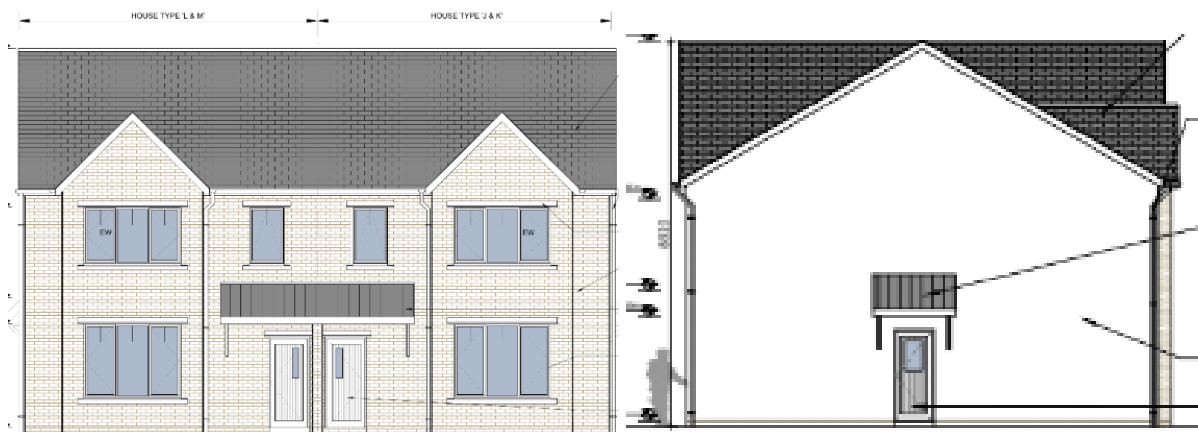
Front (left) and side (right) elevations of Maisonette-Types L & M / J & K
